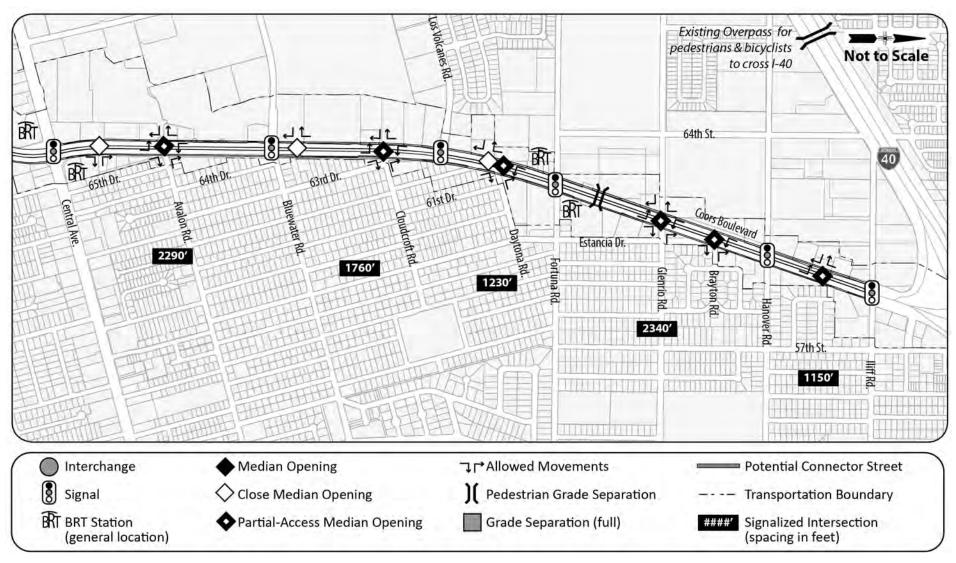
Central Avenue to I-40 [See also Table C-2.]
